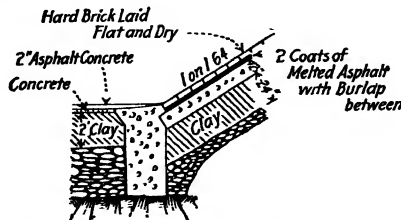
Queen Lane Reservoir, Phila. Junction of bottom lining and slope paving.
